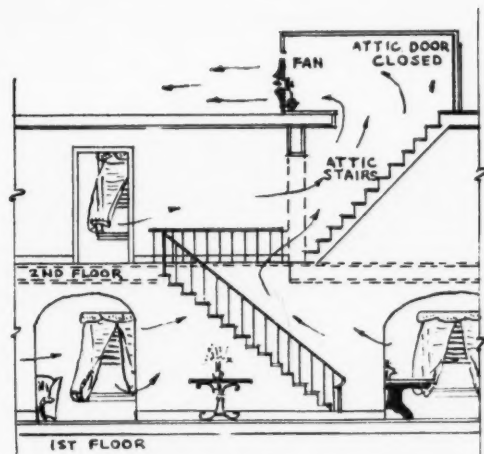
Fan installed over stairway. The fan housing is in the attic. Must have door opening into attic.
